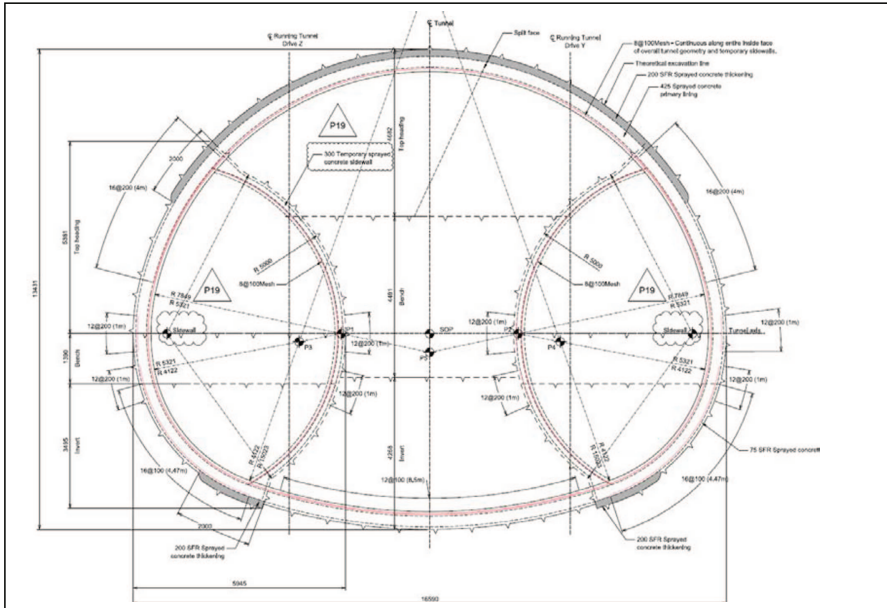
Stepney Green Cavern – Primary Lining for Largest Section
